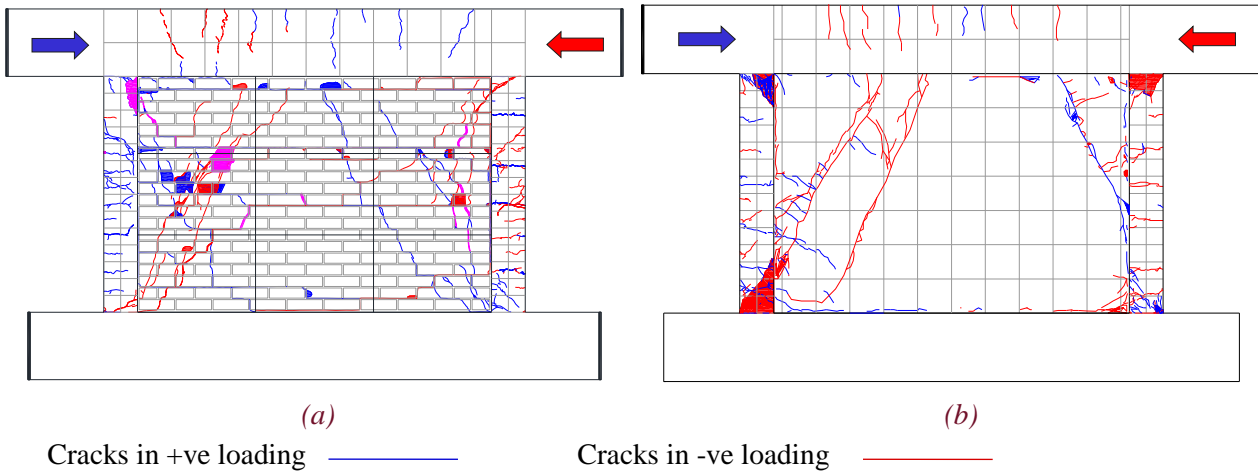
Crack pattern on (a) infilled masonry and (b) FC laminated infilled masonry at 2% story drift
